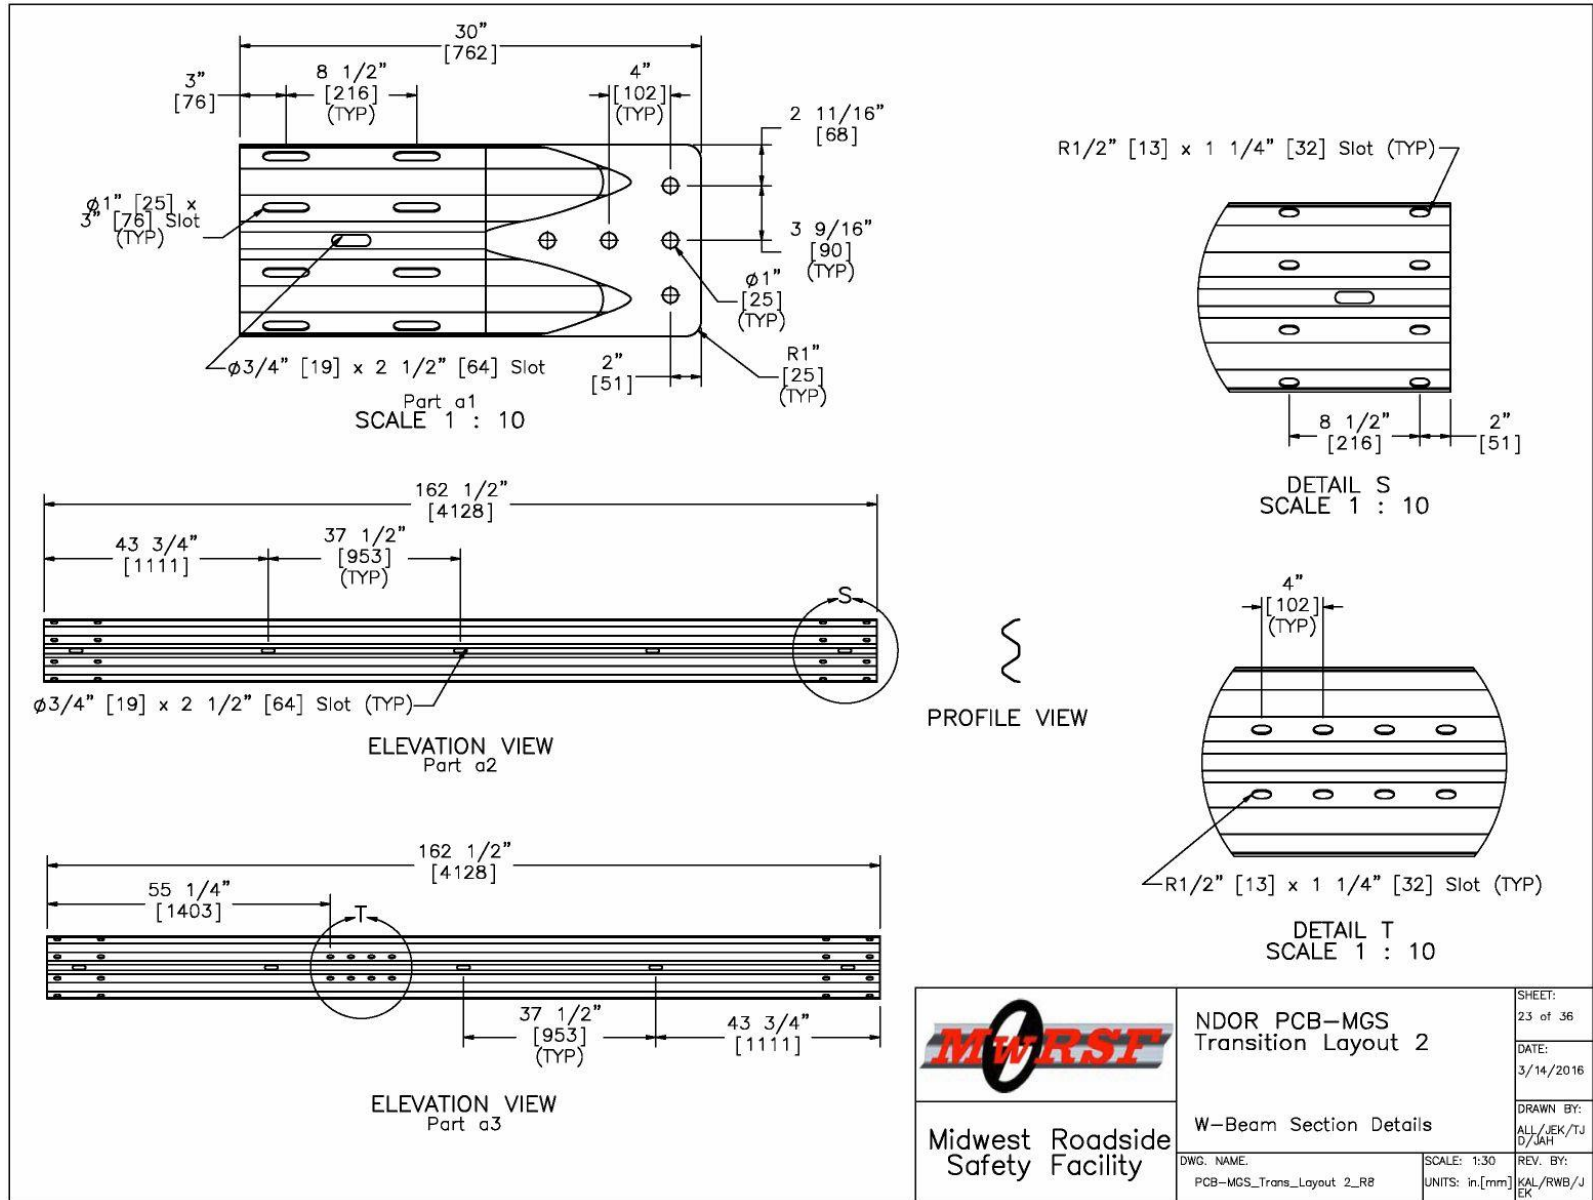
W-Beam Section Detail, Test No. MGSPCB-1
